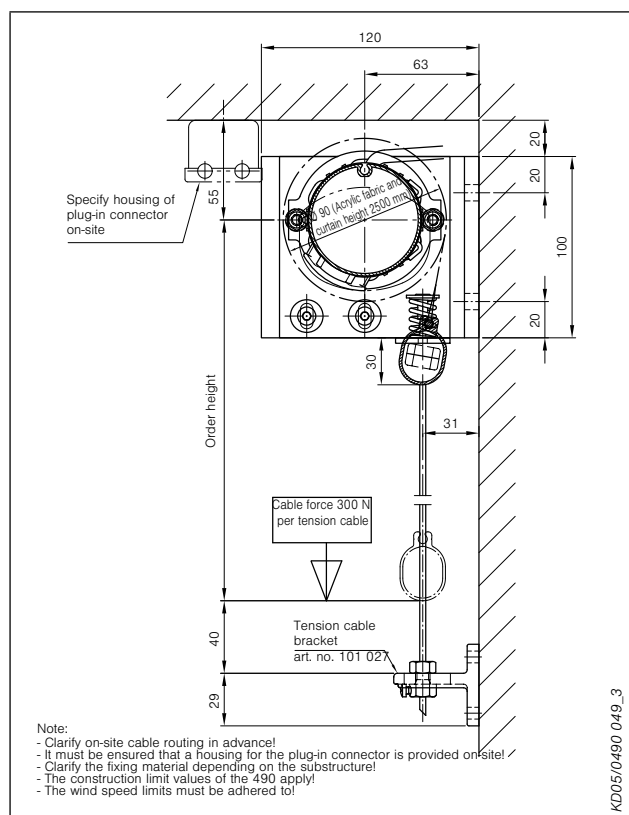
Vertical awning 491 with motor, left rolling blind with cable guidance and wall installation
